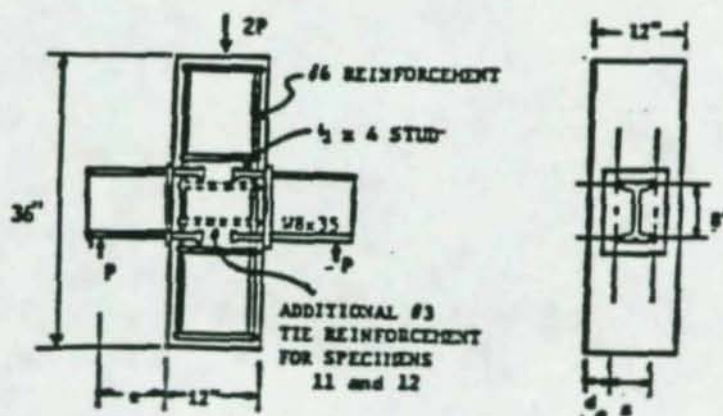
Typical test specimen used by Hawkins<sup>(14)</sup>
